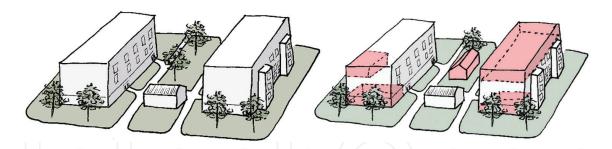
Roof and ground floor renovations and building usage changes to increase efficiency. The building's internal storage facilities have been moved to a new outbuilding.
